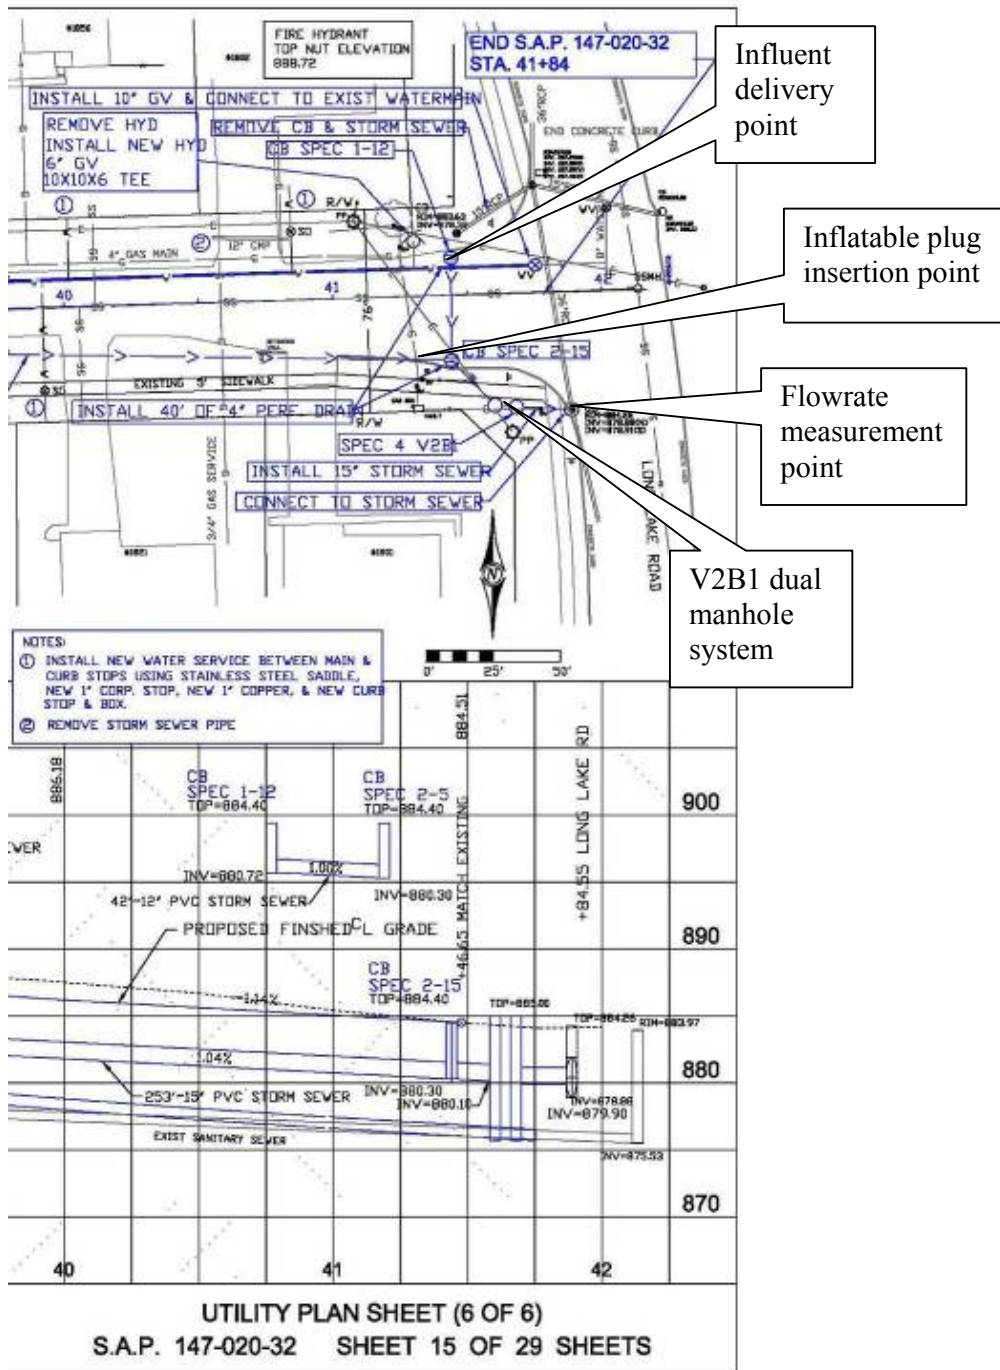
Plan and profile of Environment21 V2B1 Model 4 installation site at intersection of Rice Creek Road & Long Lake Road, New Brighton, MN
